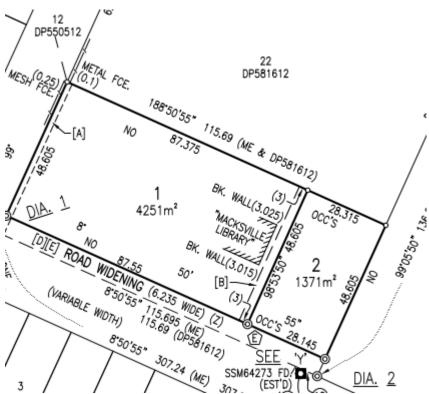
Plan of proposed subdivision with [B] being an easement for maintenance 3m wide.
